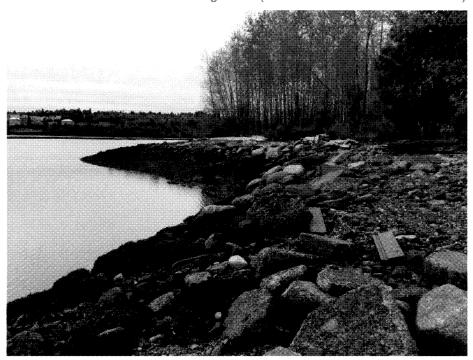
West side of Northeast Basin looking north (construction waste on foreshore)
